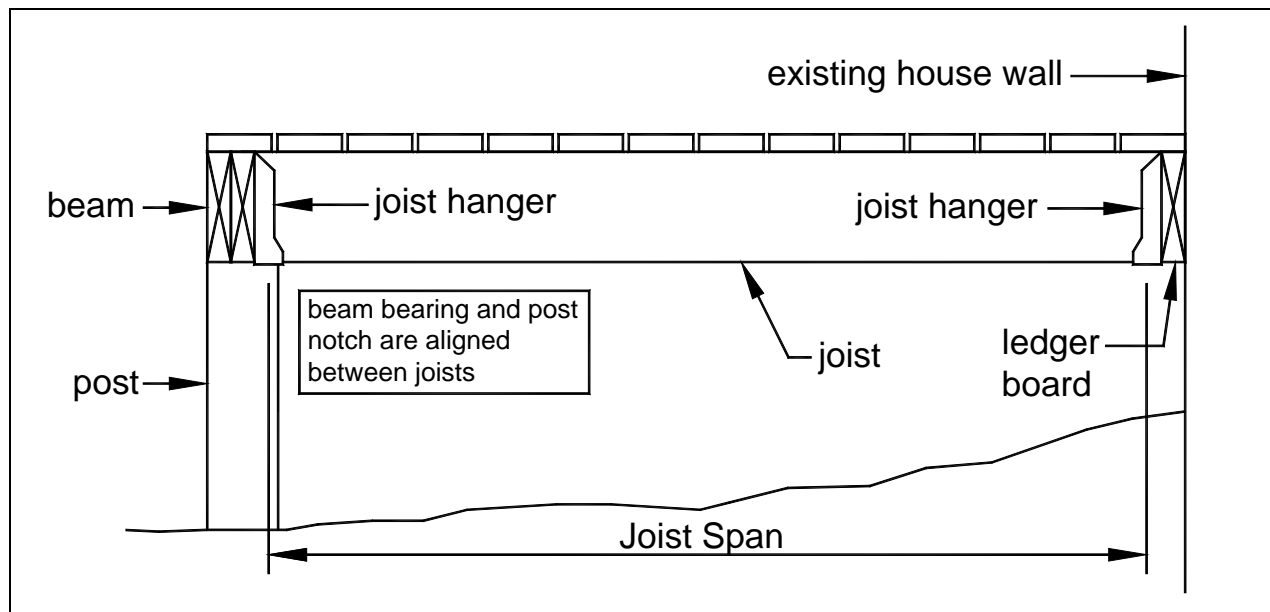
JOIST SPAN - JOISTS ATTACHED TO SIDE OF BEAM
